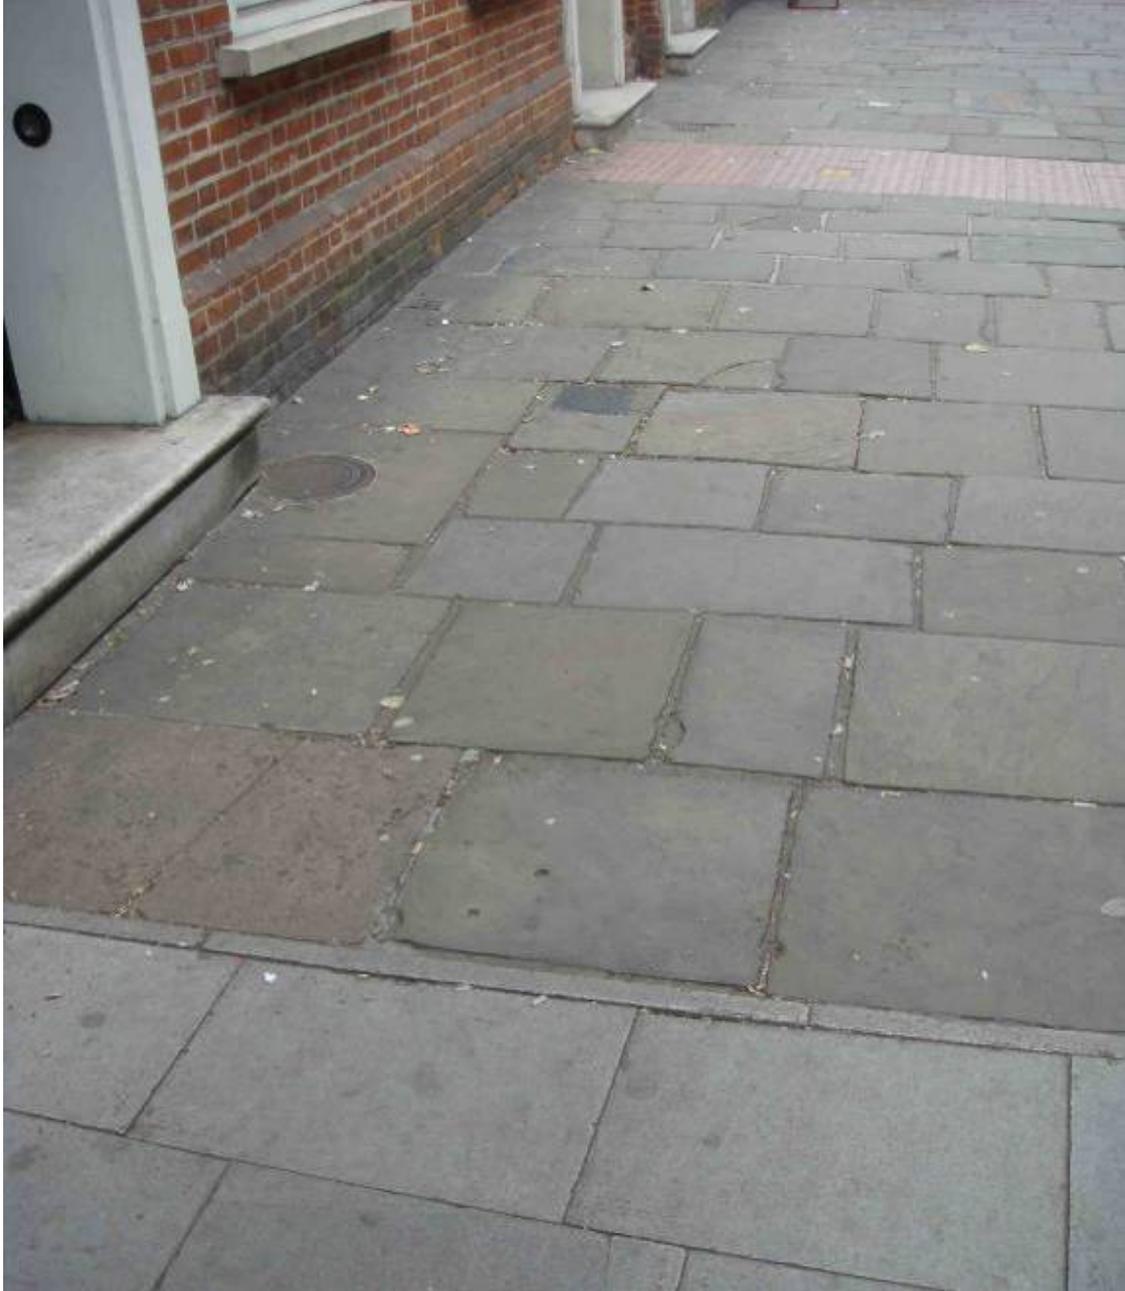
Historic York stone paving (centre top of picture) to the front of numbers 52 to 55 Newington Green. Note the contrast with the concrete paving (bottom of picture)
